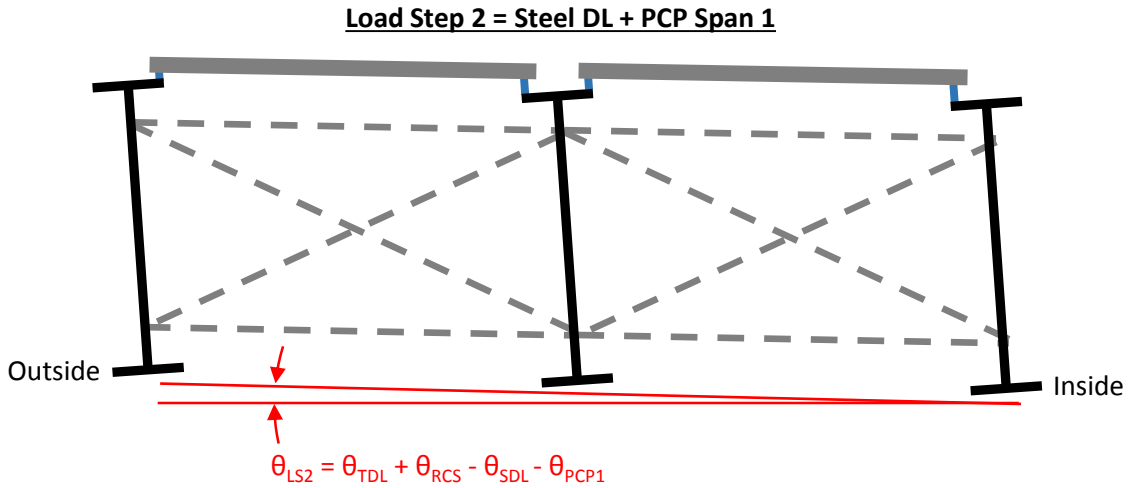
Load Step 2– Steel I-Girder System Twist SDLF – Section A-A
